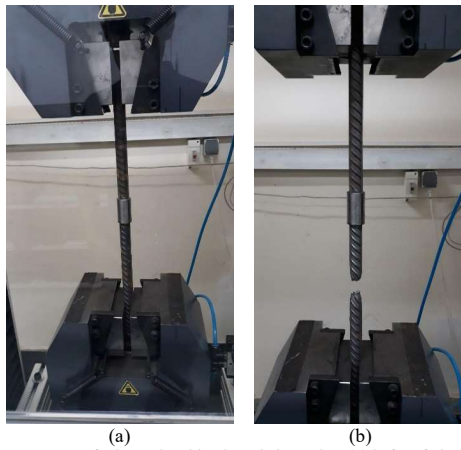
Tensile test setup of a bar spliced by threaded coupler: (a) before failure, (b) after failure.
